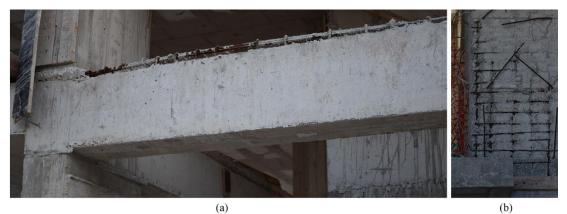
Shifted Reinforcing Bar Cages in: a Beam (a) and in a Sheer Wall (b). Residential Buildings, Mağusa, North Cyprus. (Case Study #111 (Page 203)).
